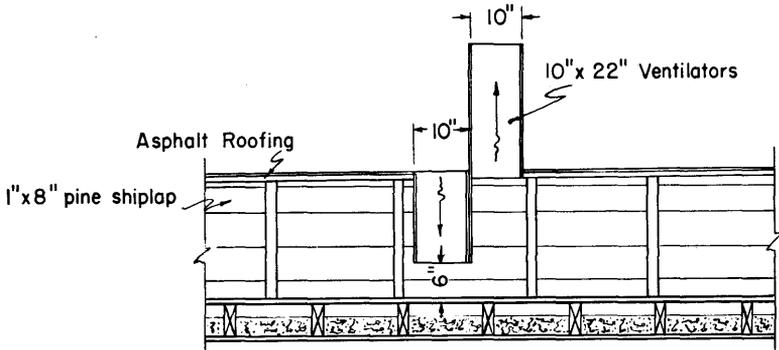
SECTION THROUGH ROOF CONSTRUCTION SHOWING SPECIAL ATTIC VENTILATORS.
